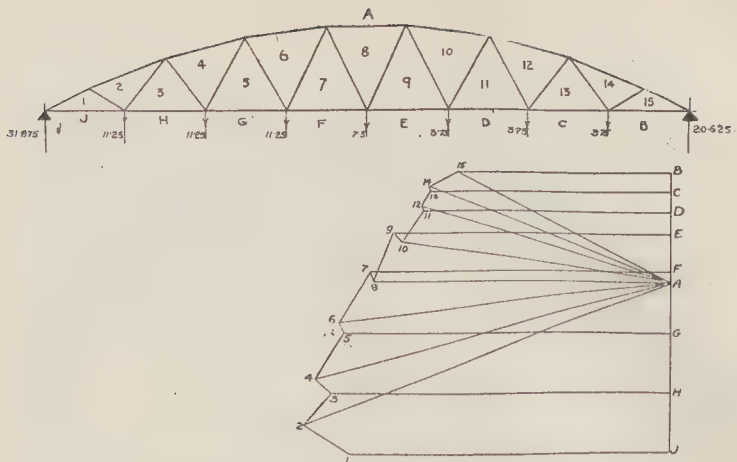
Bowstring Truss with Live Load on Half Span.
